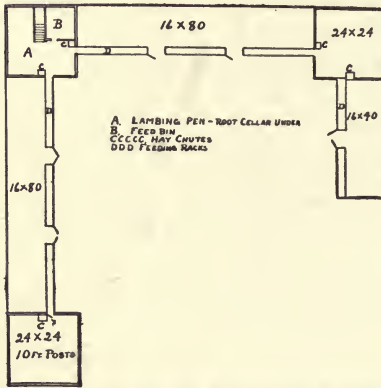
PLAN OF SHEEP BARN WITH YARD PROTECTION
